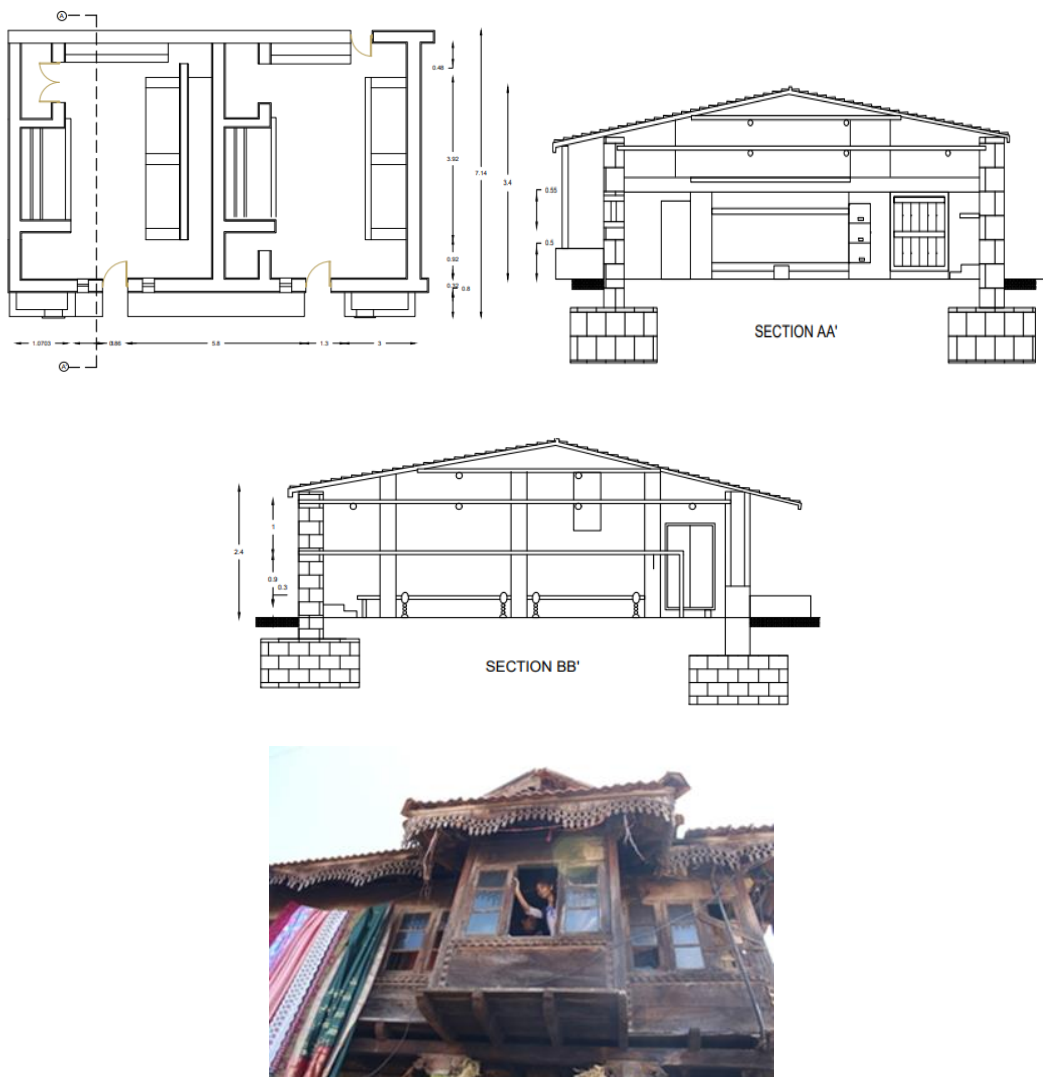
Floor Plan,Section and elevation of wooden house of Poombharai
